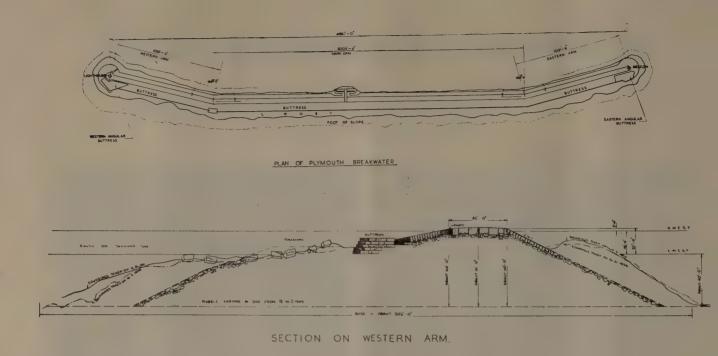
Plan of Plymouth Breakwater and section on western arm.
